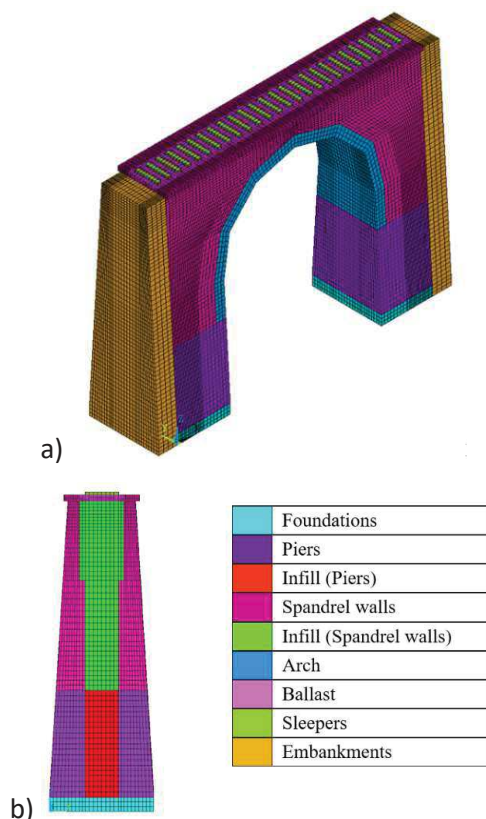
3D ANSYS numerical model of Leça bridge: a) perspective, b) transverse section
